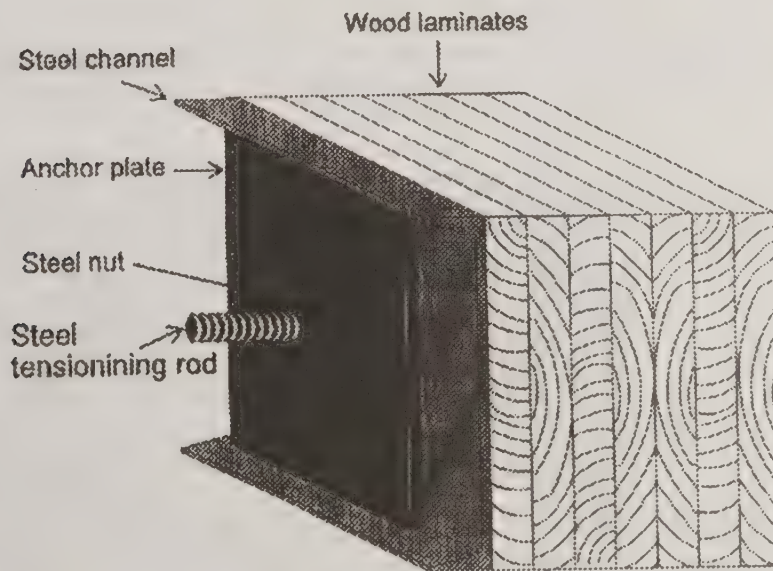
Steel channel, anchor plates, and tensioning rods used on WVU-designed stress-laminated timber bridges. (Figure provided by the WVU Division of Forestry)
